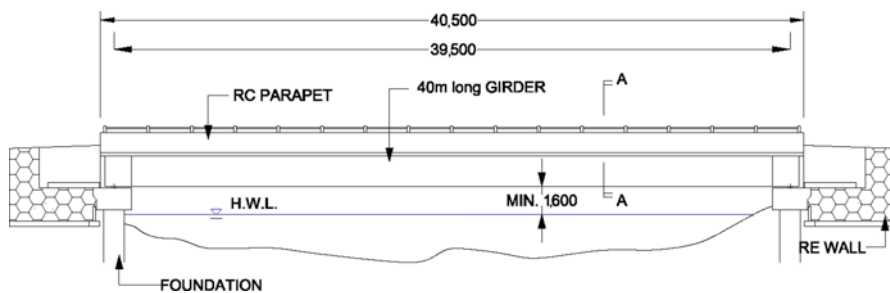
Layout of a 40 m long span concrete road bridge
